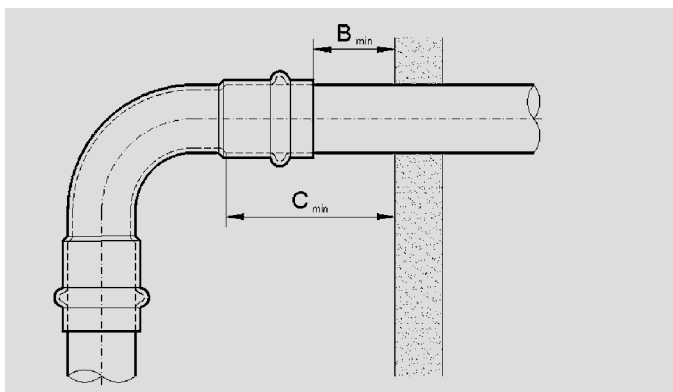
Minimum distance from wall/floor to front of press fitting (B) and socket end from wall (C) for sizes $d \leq 54$ mm (see Table 16)
